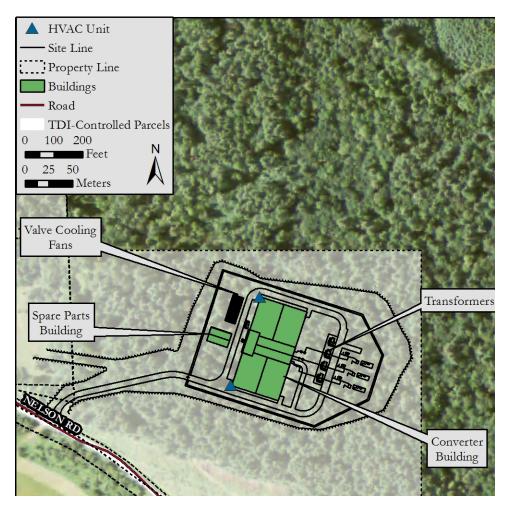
SCHEMATIC LAYOUT OF THE PROPOSED SITE
